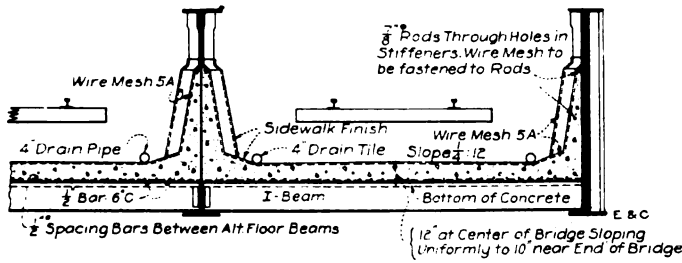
Section of Typical Bridge Floor—Concrete Slab and I-Beams.
